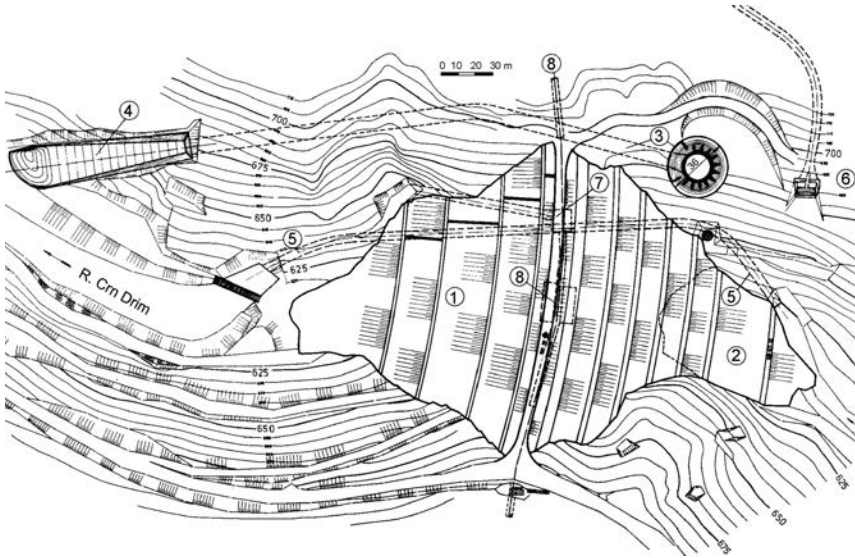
Hydraulic scheme for the Globochica Dam (Macedonia). (1) Earth-rock dam; (2) cofferdam; (3) spillway; (4) spillway chute with flip bucket; (5) diversion tunnel, modified into a bottom outlet; (6) intake with tunnel supply; (7) underground valve chamber; (8) grouting gallery.
